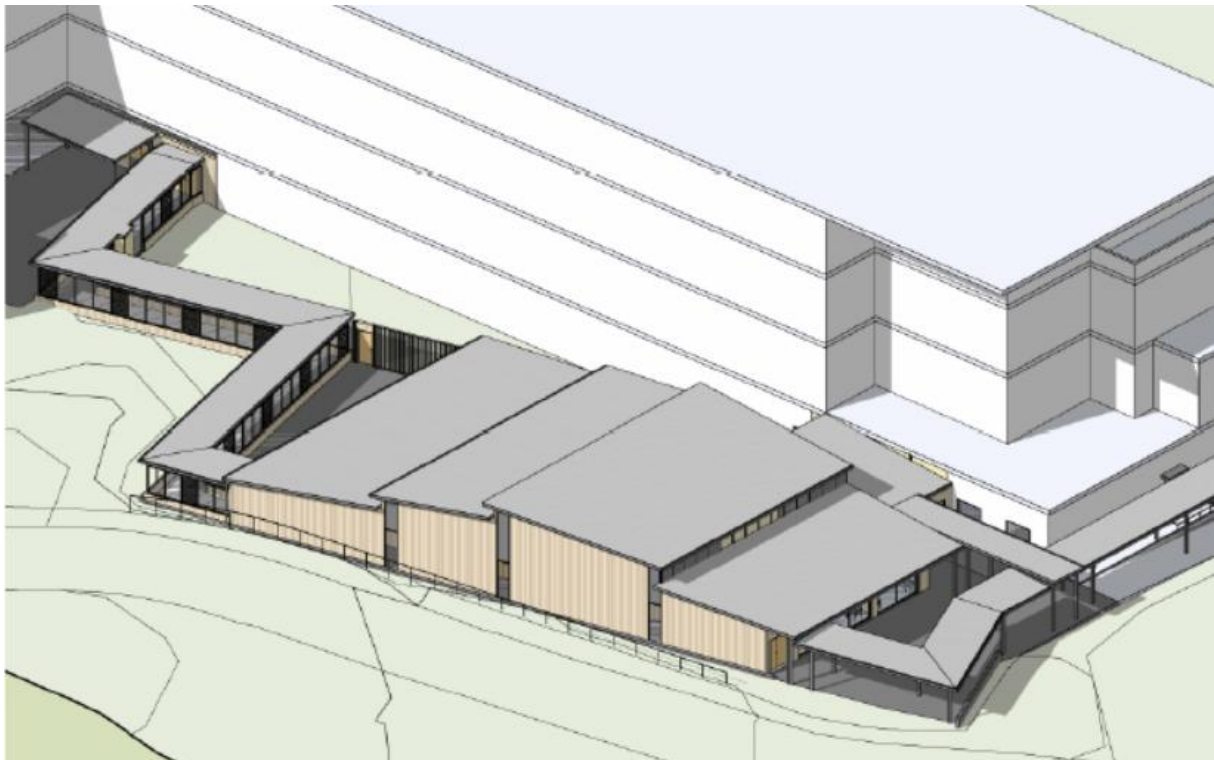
Location of the new PCU on the ground floor adjacent to existing ASB at Tamworth Hospital
